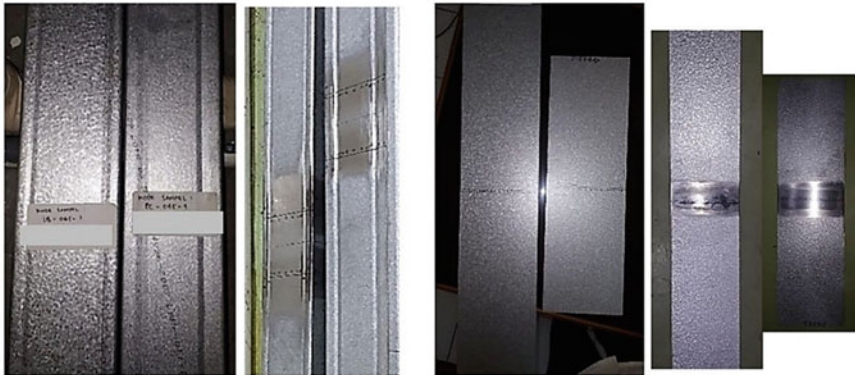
Cold-formed steel specimens with coating and uncoating; lip channel C-section (left) and flat steel sheet (right)
